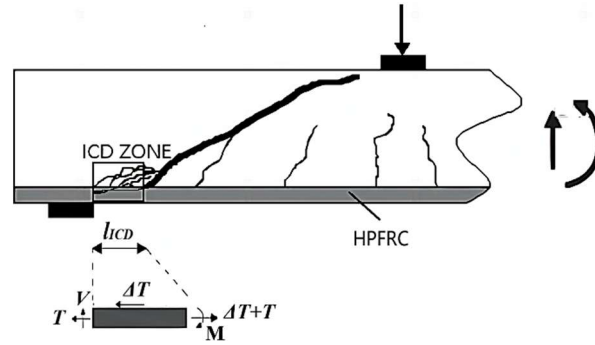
Fatigue shear failure diagram for bottom bonded HPFRC-RC beam.
